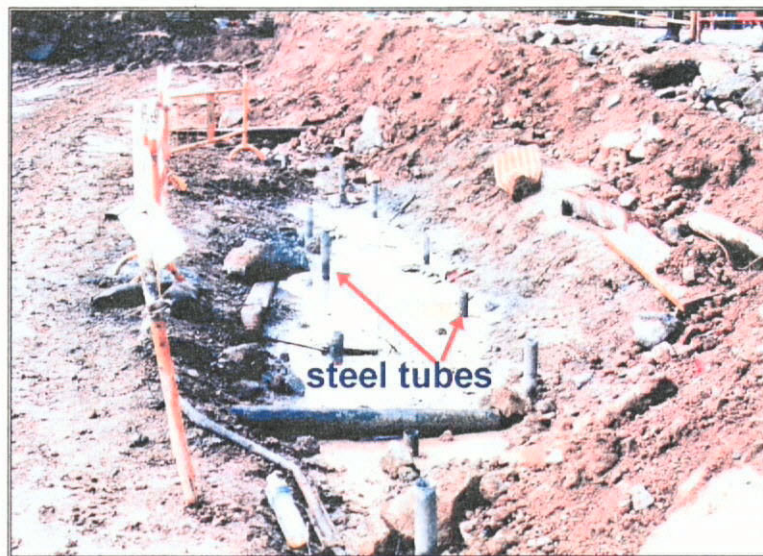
Staggered tube-arrangement in a diaphragm wall panel
